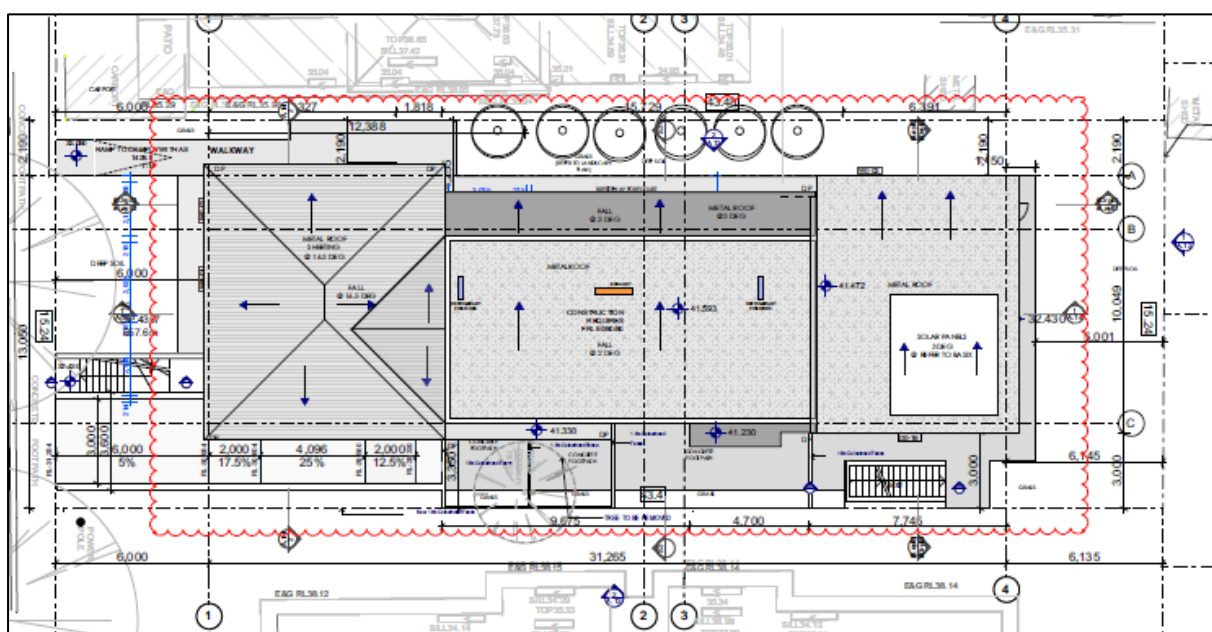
Proposed site plan – 37 Claremont Street Campsie 2194
